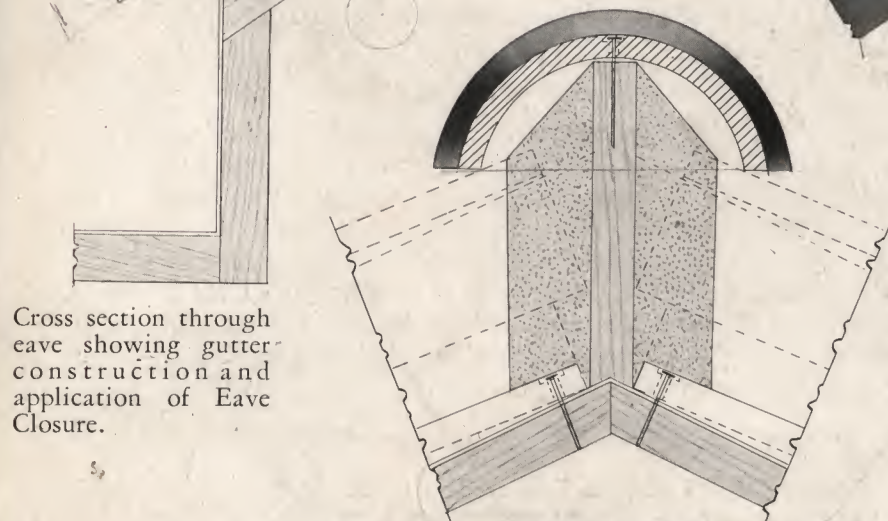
DETAILS OF "IMPERIAL" STRAIGHT BARREL MISSION TILE AND FITTINGS
